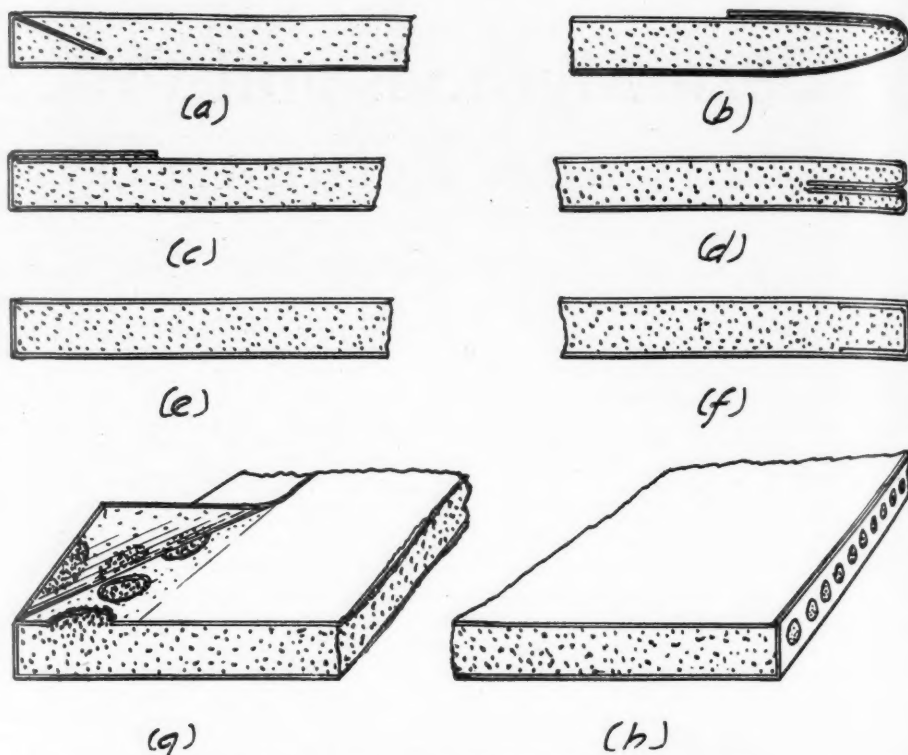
Typical folds for inclosing the edges of wall board with the paper covering—(a) Original folded edge for plaster and wall board—face paper folded under back paper; (b) and (c) Face paper folded over back paper; (d) Both papers folded to center; (e) Face paper just meeting back paper—no folding; (f) Insertion strip sealed between papers; (g) Back paper punched to allow plaster to make seal through holes; (h) Face paper punched to allow plaster to anchor enclosing edge in place. Types (d), (e), (f) and (h) may be made reversible
